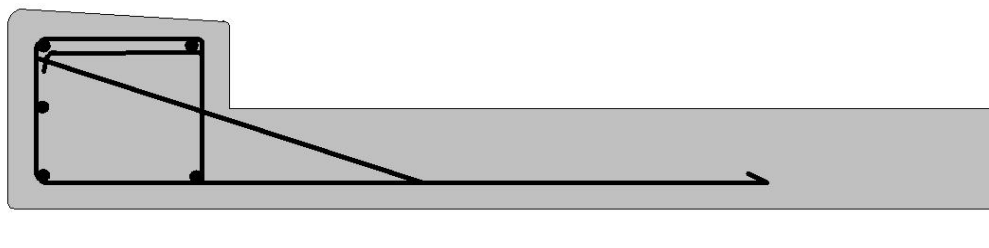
Edge beam detailing. Adapted from (Trafikverket, 2000).
